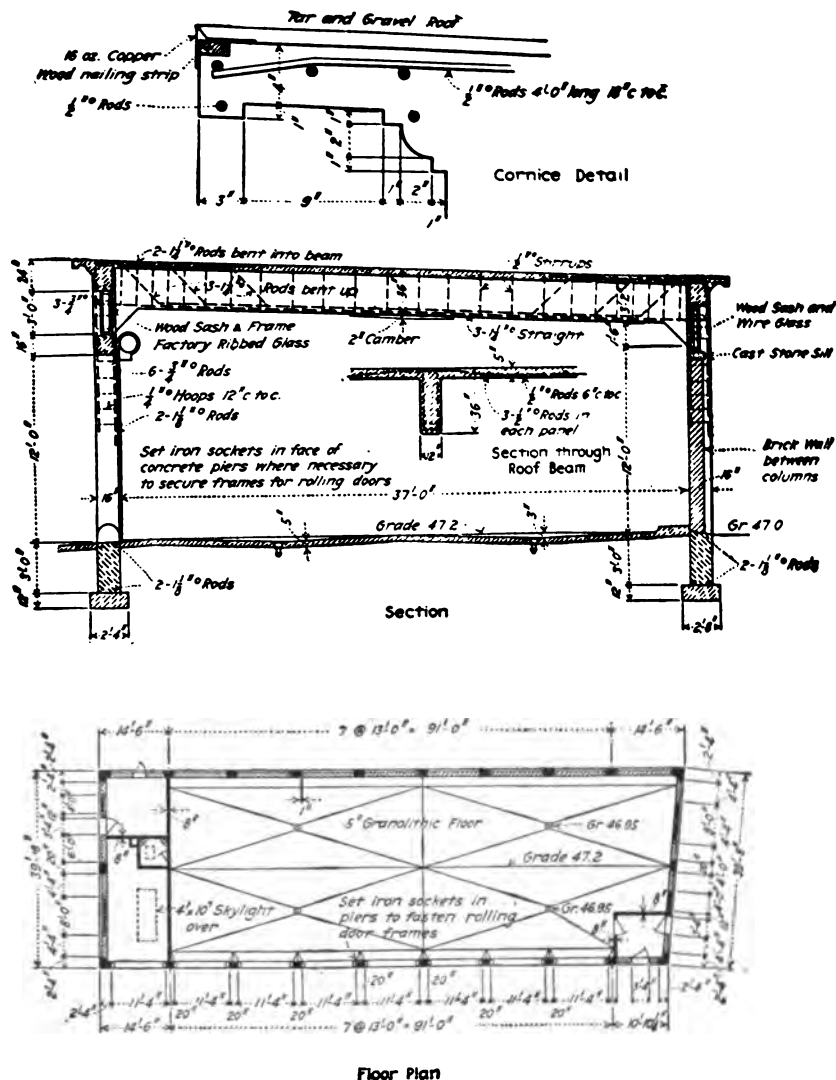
Truck garage, Pacific Mills, Lawrence, Mass.
